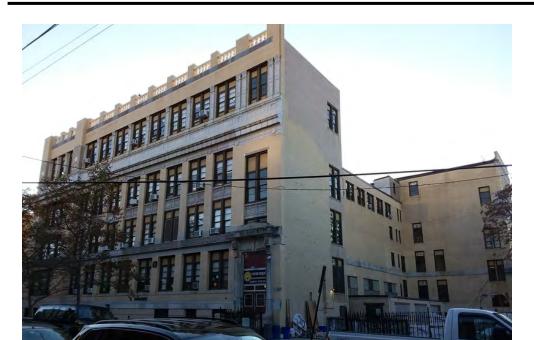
Looking at the entrance on the south elevation of the building, view north.
